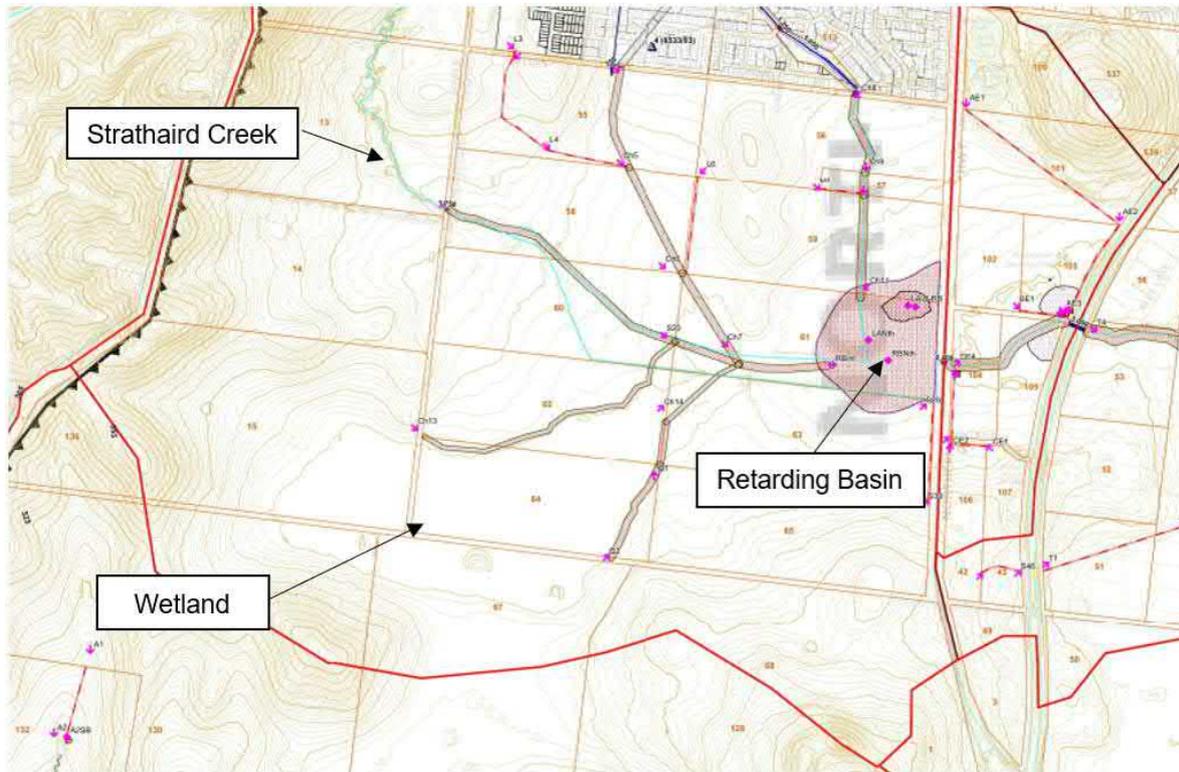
The southern section of the Taylors Creek Drainage Scheme covering the Wallan South Precinct with contours, drainage channels and retarding basins marked (Melbourne Water, 2017a)
